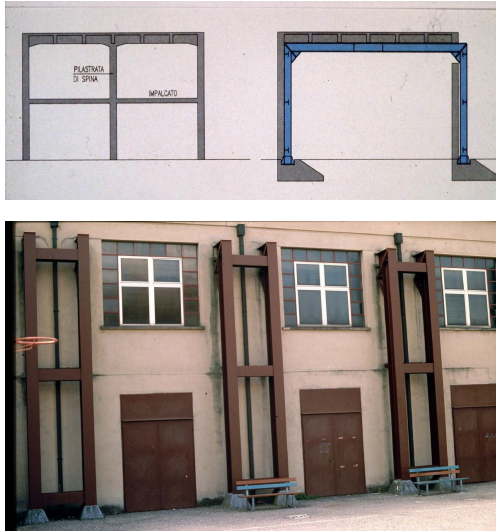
A new steel structure inserted in the original lay-out of a r.c. building, (Cantù, Como, Italy) (Mazzolani) [159]
